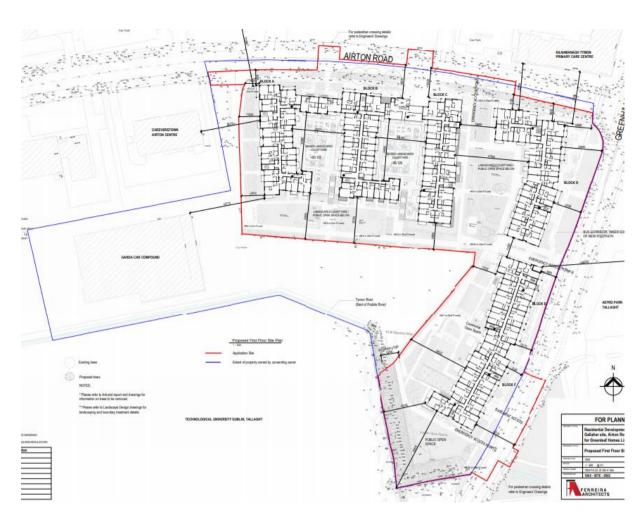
First floor layout plan approved under ABP Ref. ABP-306705-20
